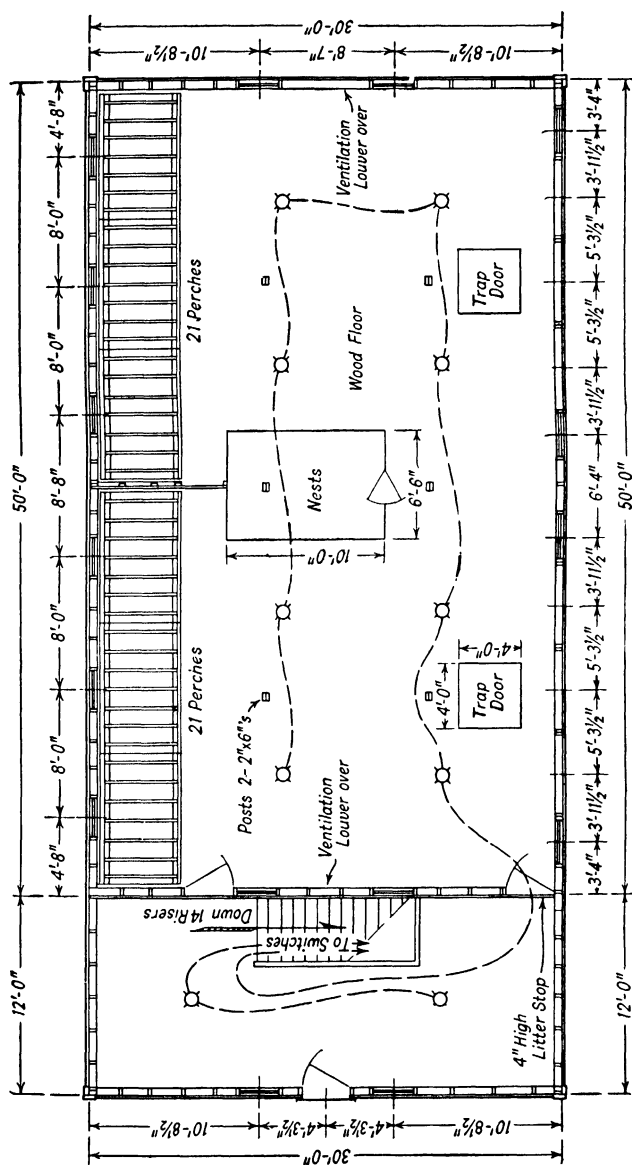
30' X 50' laying house. Second-floor plan. The first-floor plan provides for driving through on the inside from end to end.
